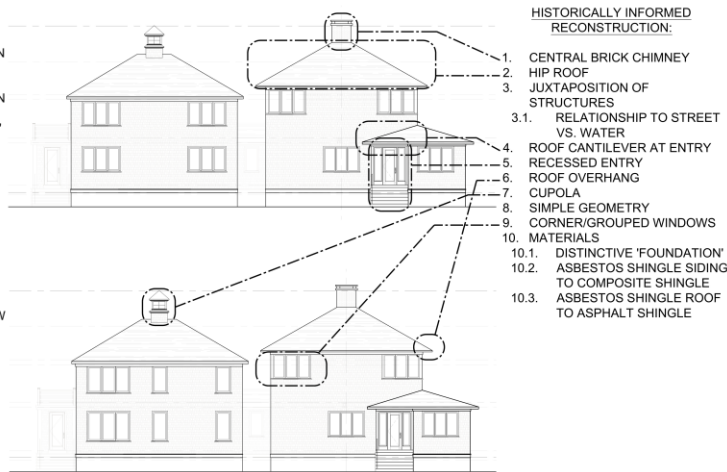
Historically informed reconstruction – Options A1 and A2 (single-building configuration).
